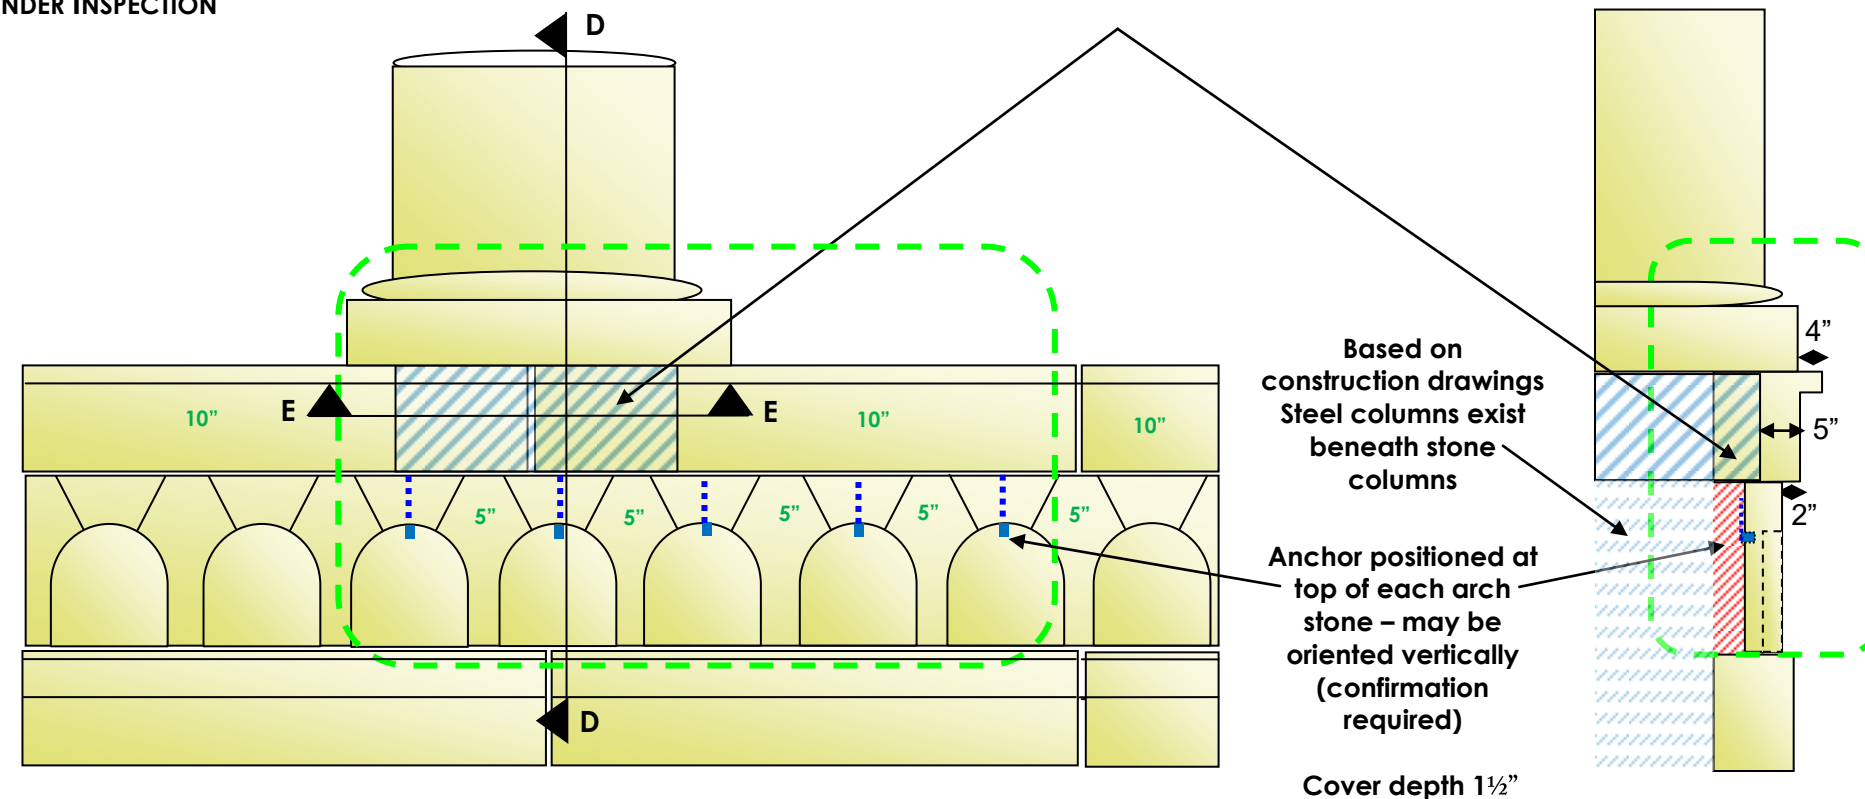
B: SCHEMATIC ELEVATION SHOWING METALLIC INCLUSIONS (ASSUMED STEEL CONTAINING PLINTH AND DOWELS) AND STONE THICKNESSES
